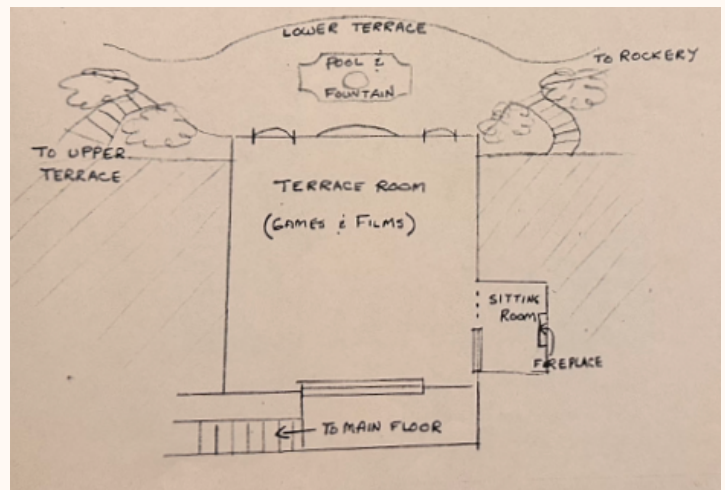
Floor Plan depicting how the lower ground floor would have looked c. 1930. (Glendon Hall 1920-1950)
